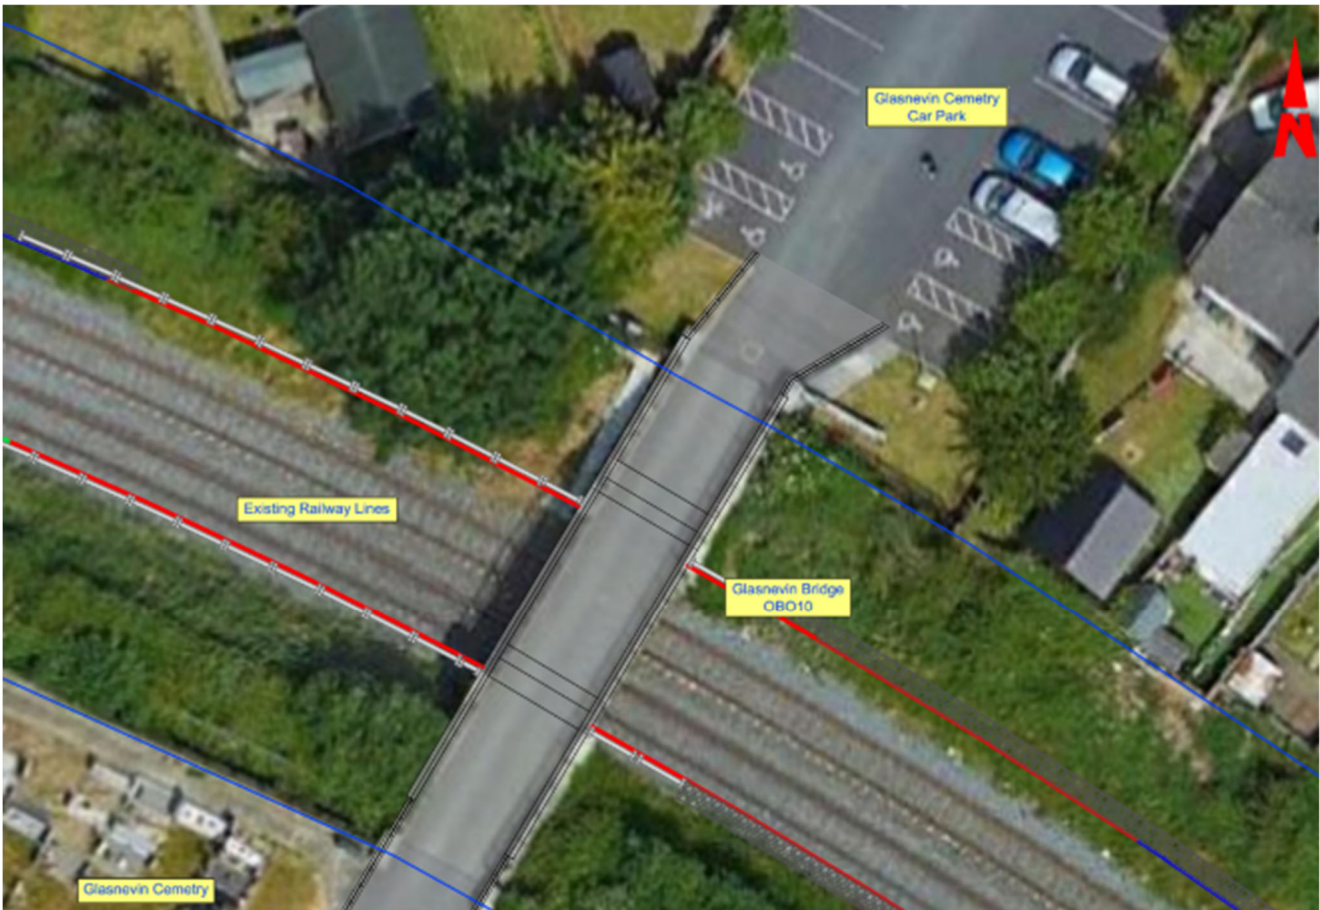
Glasnevin Cemetery Road Bridge (OBO10) – General Arrangement
